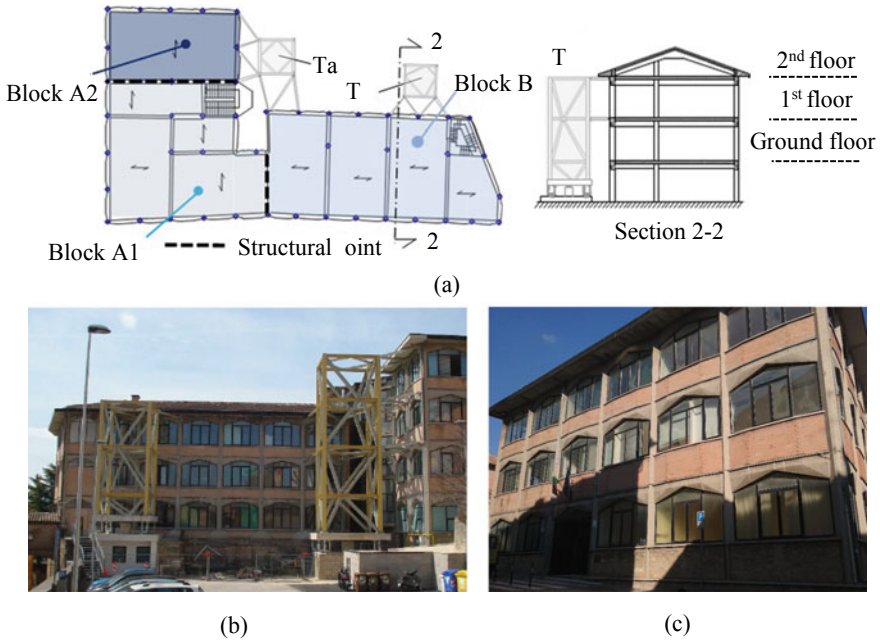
The Costanza da Varano high school: a plan view and cross-section; b photo of the building with the Dissipative Towers; c photo of the facade of the building
